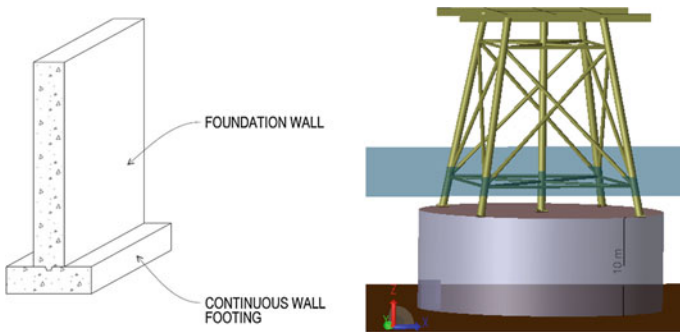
Examples of strip footing (left) and spread footing (right)
